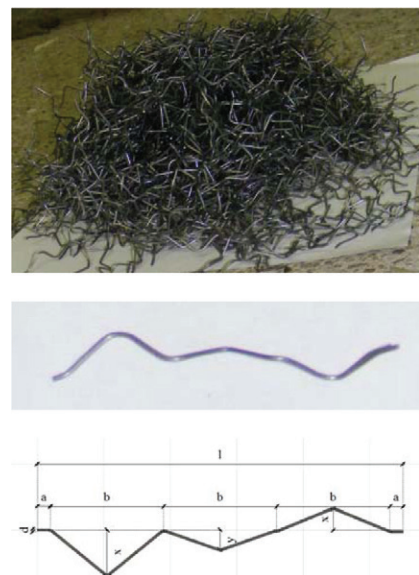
3D deformed, twisted steel fibre, PetiX S60
